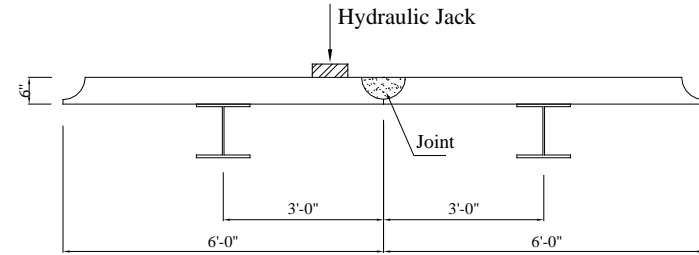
Wide Beam Test – Tilted Loop-Bar Detail
